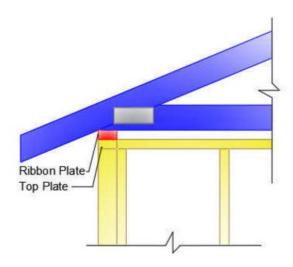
above shows a ribbon plate installed on top of a timber stud wall top plate to raise the level of the truss, so the bottom cord has the required clearance over the internal walls.
